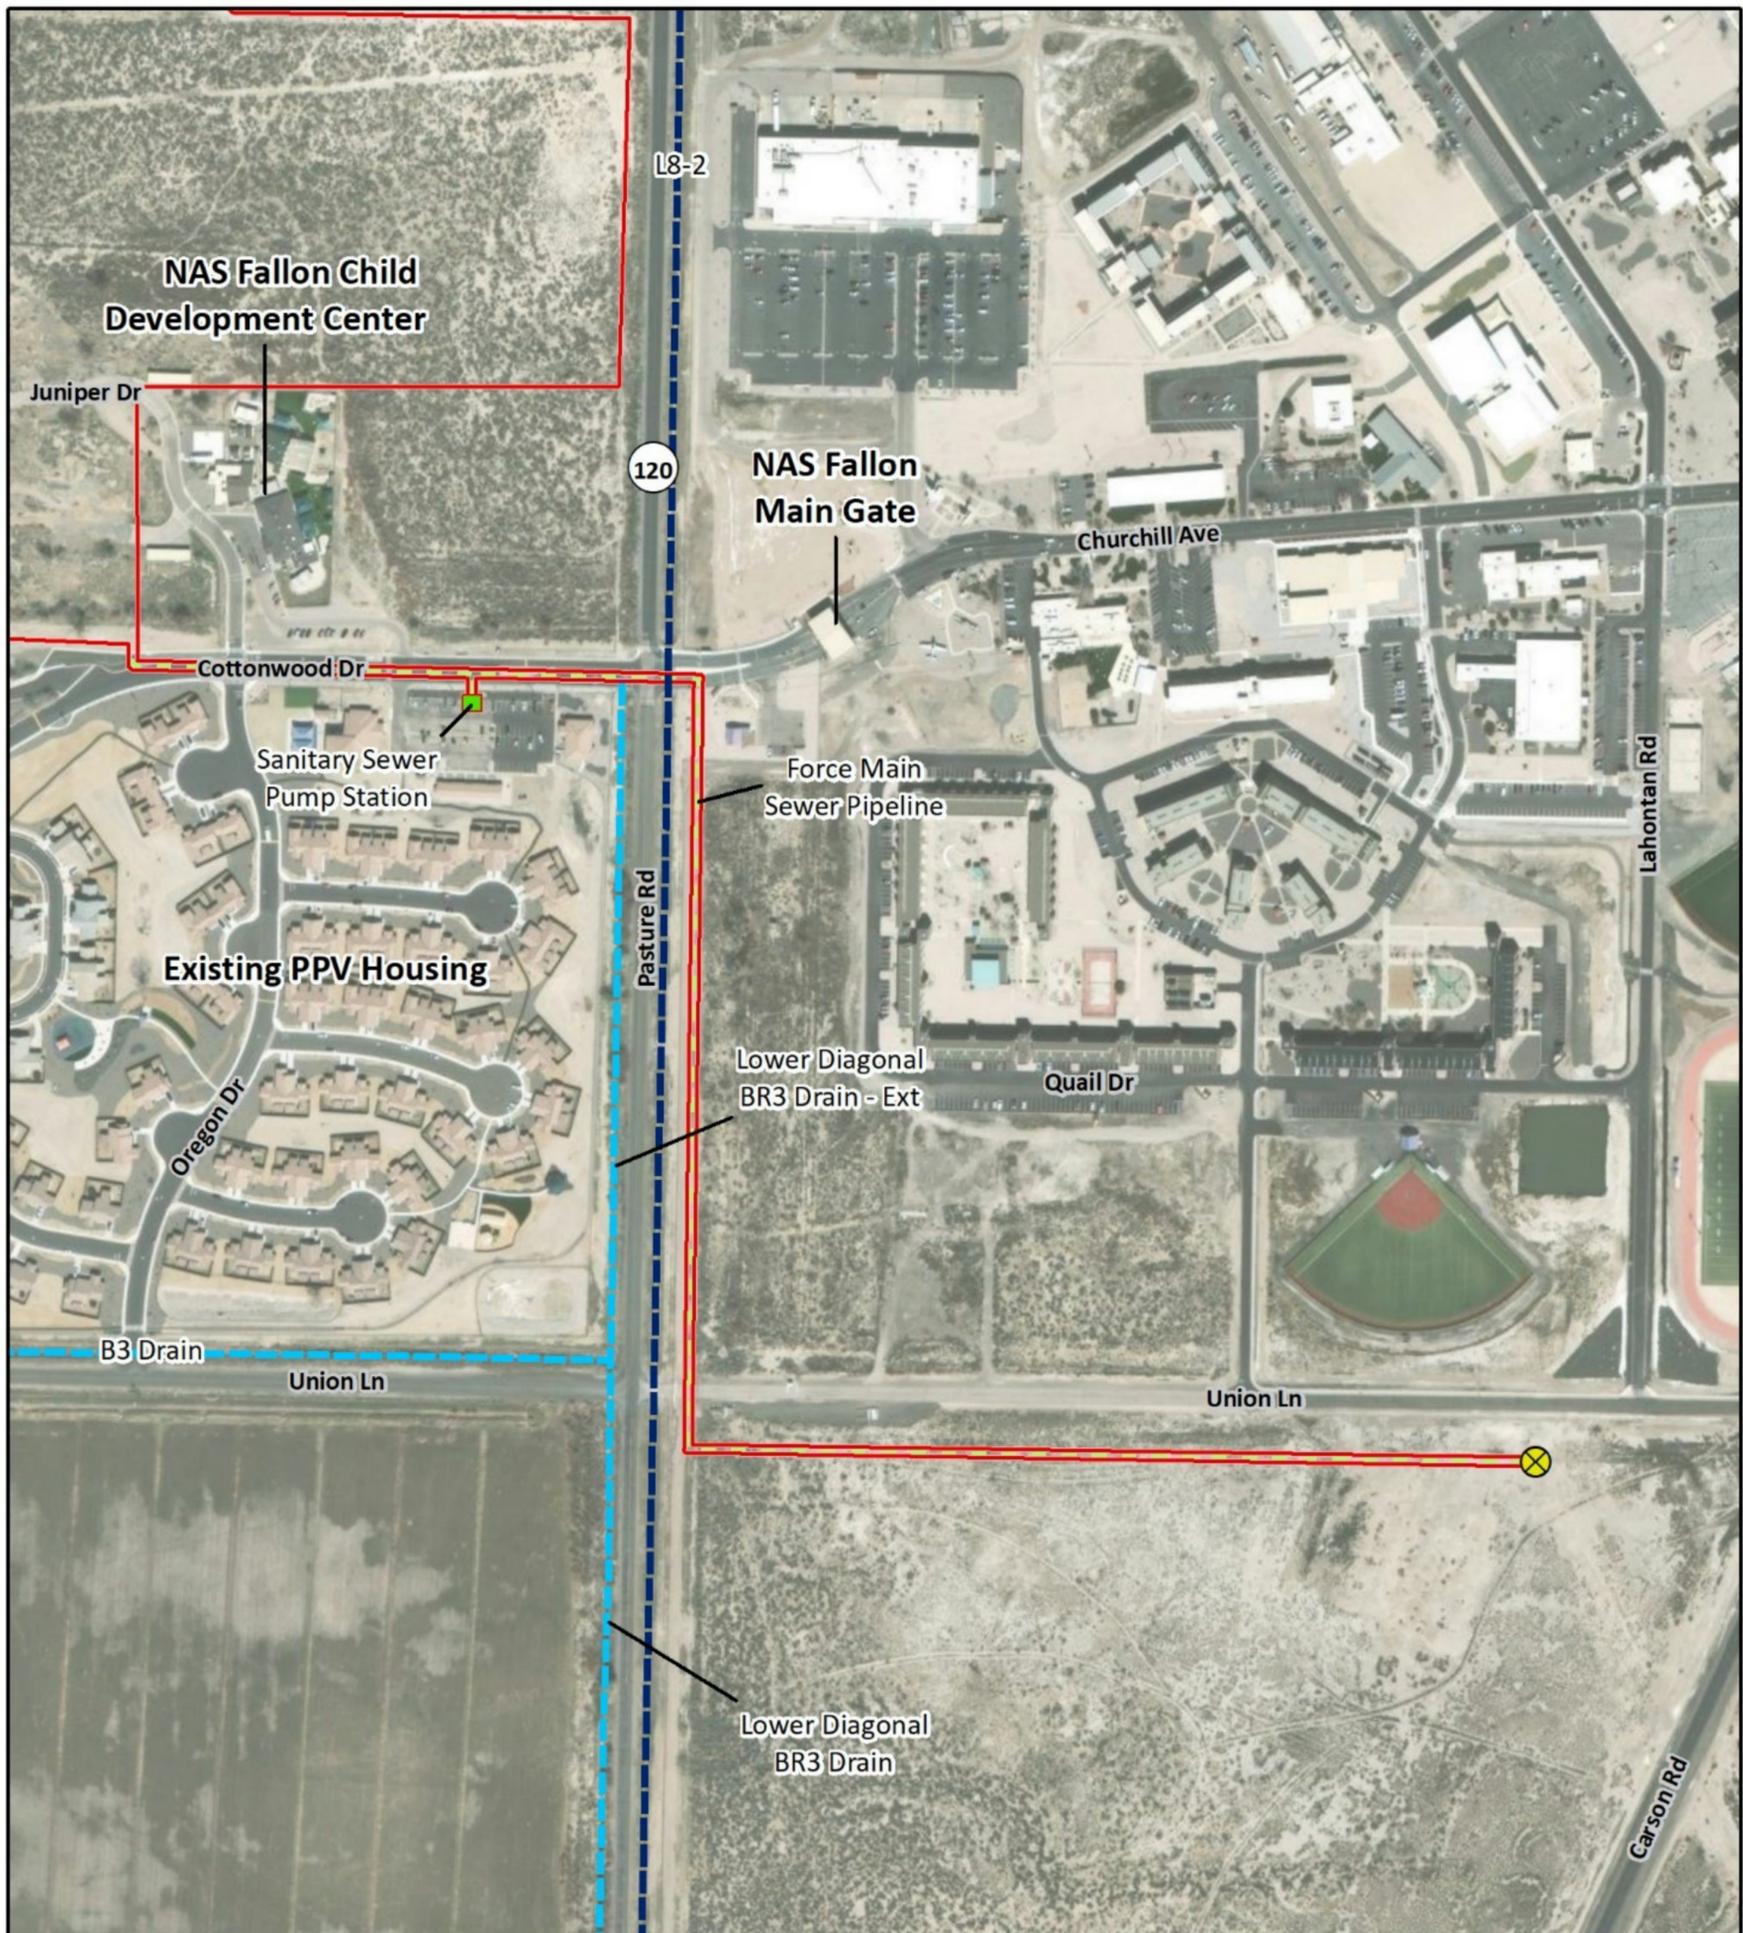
Proposed New Sanitary Sewer Pump Station and Force Main Sewer Pipeline
